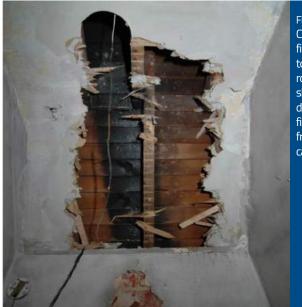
Close up of fire damage to pitch roof (arrow showing direction of fire spread from wall cavity)
